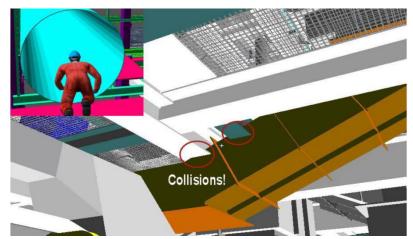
Collision Detected Between Structural System and Ventilation System through VR Model (Woksepp and Olofsson, 2006)
